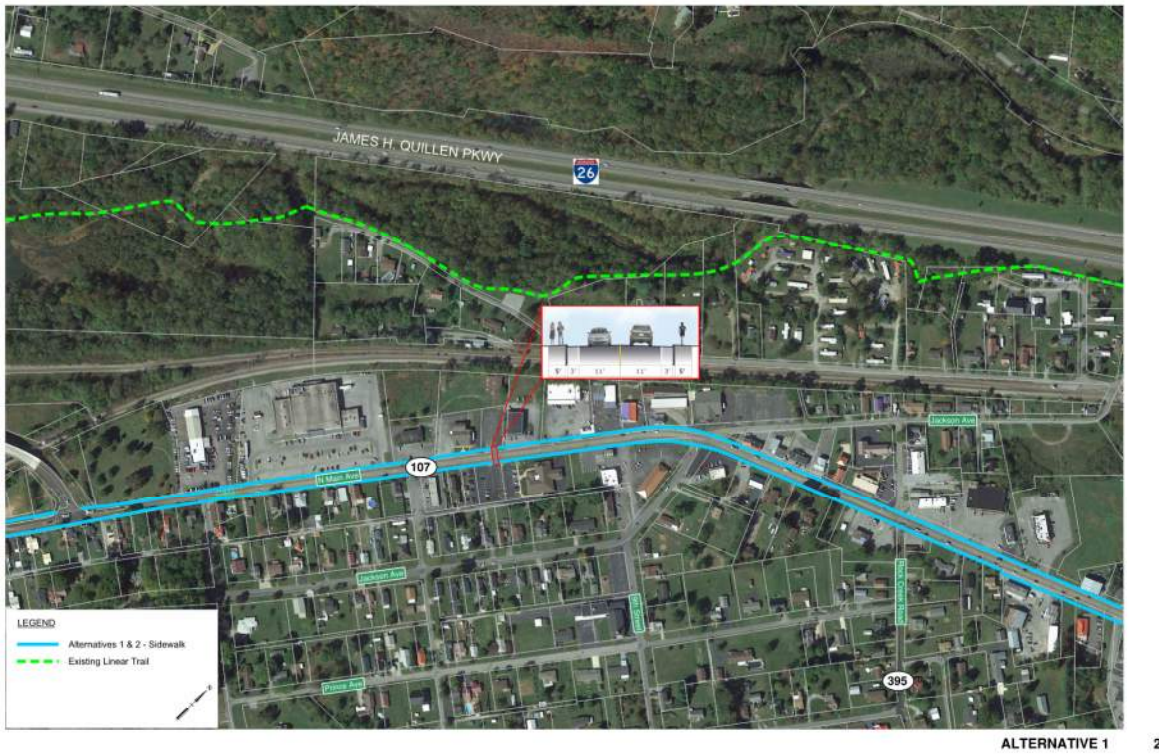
Erwin and Unicoi Recommended Alternatives 1 – Plan Sheets Page 3
